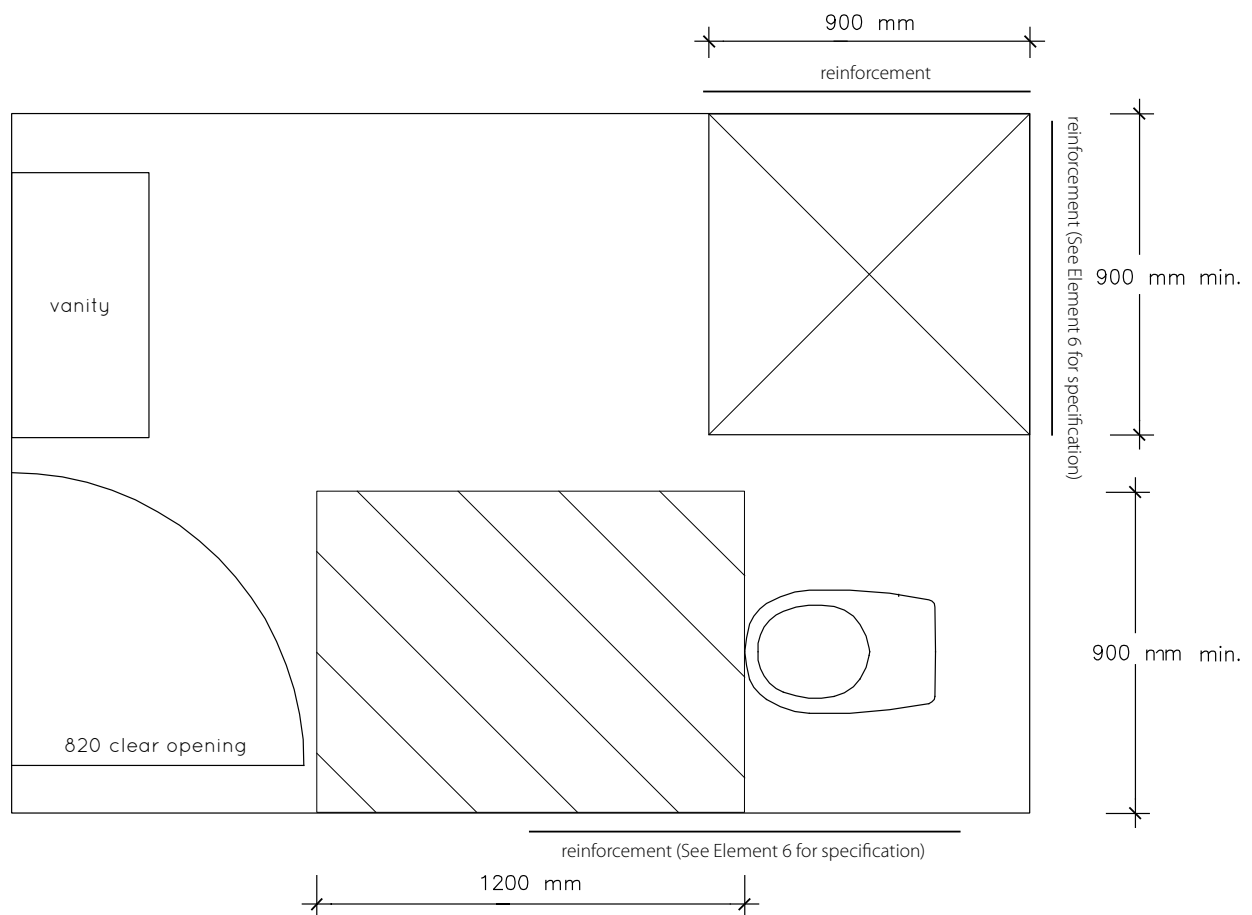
(b) Silver level ground (or entry) level toilet layout and space requirements in a combined bathroom.
